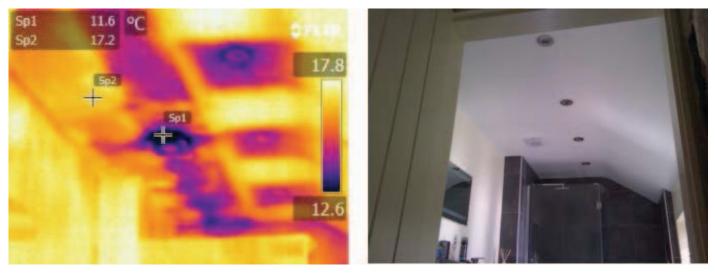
White House Farm, Stirton, Skipton. Reduced insulation in the ceiling of the first floor en-suite shower room.
